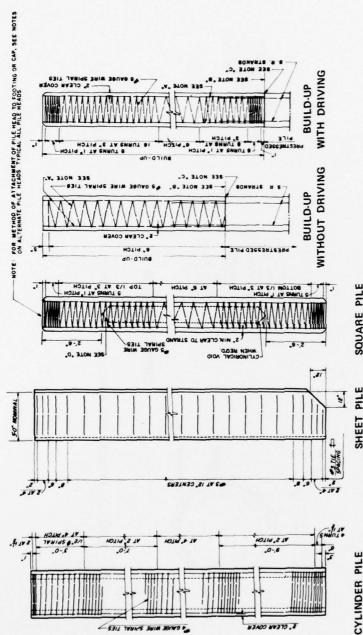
Typical details for pretensioned prestressed concrete piles (sheet 1 of 3)
